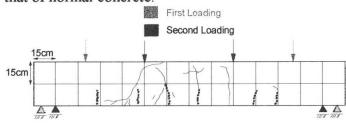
Crack Pattern of Series B (Normal Concrete, Water Curing)
